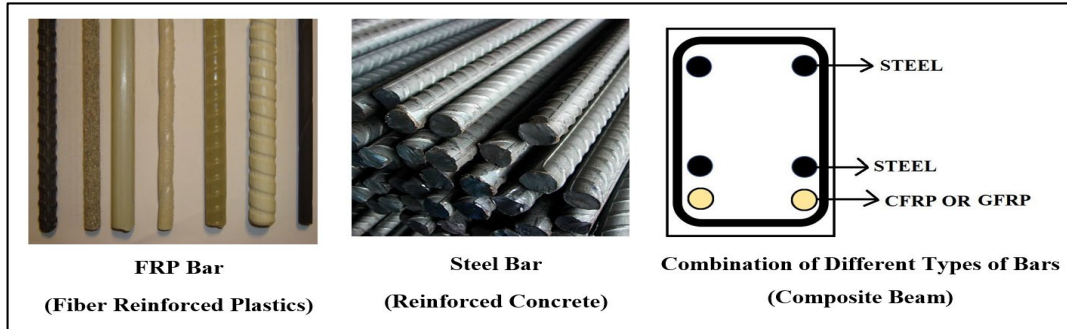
Concrete reinforced beams with hybrid FRP/steel rebars [21]
